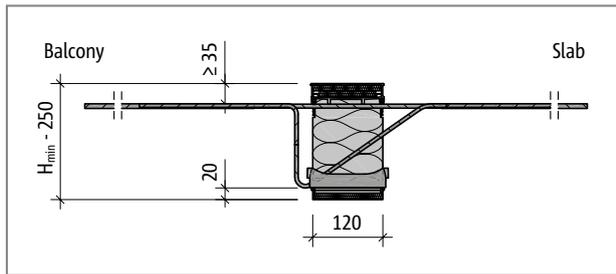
Schöck Isokorb® XT type K-M1 to M4: Product section
